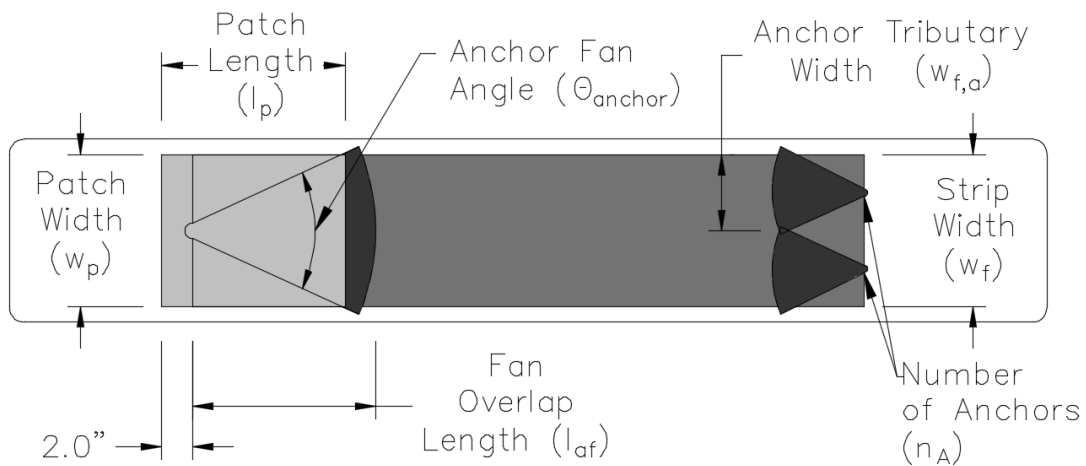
Plan view of anchor system; left: anchor prior to adding patches, right: patches over anchor
